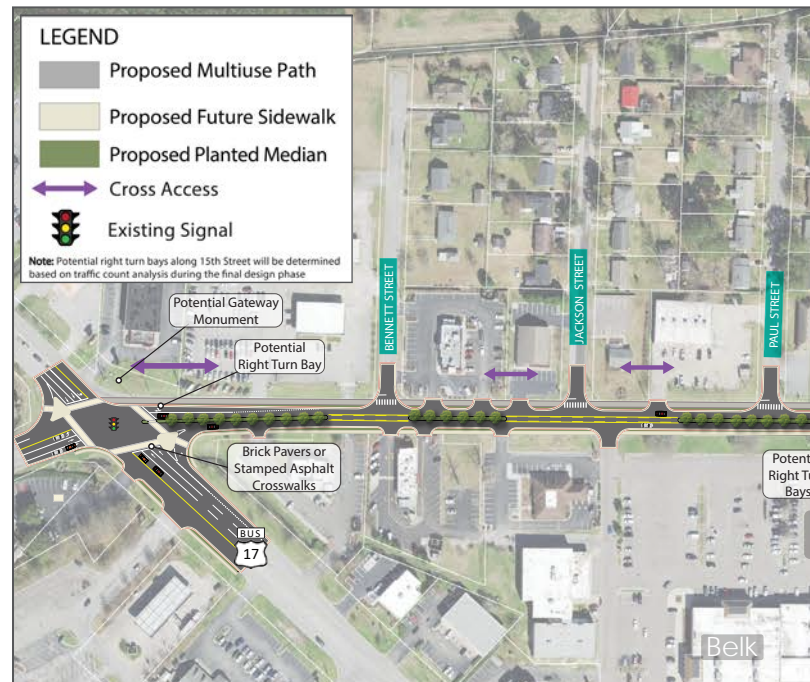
Proposed concept designs for Carolina Avenue to Van Norden Street
